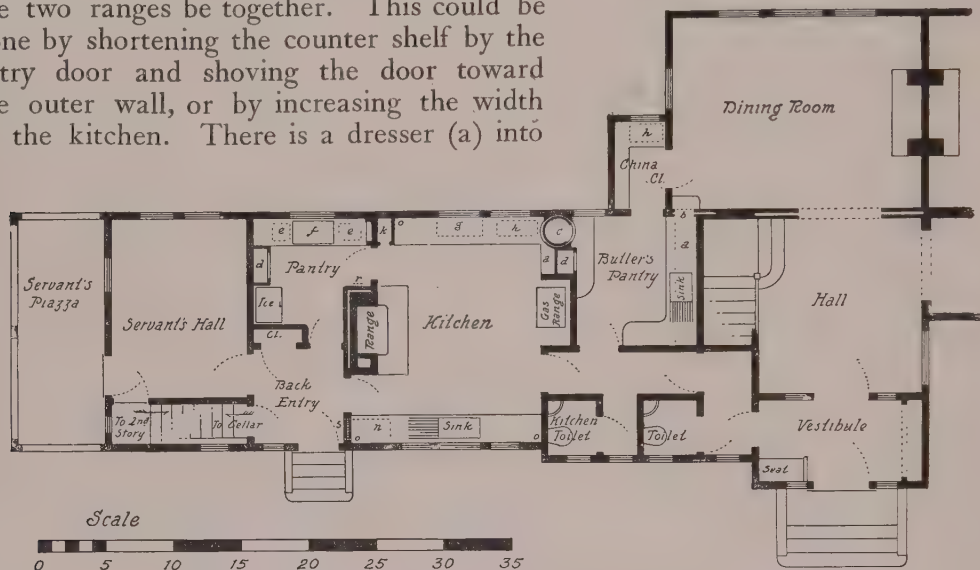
Plan showing a good outlay of kitchen, dining room, service, etc.
